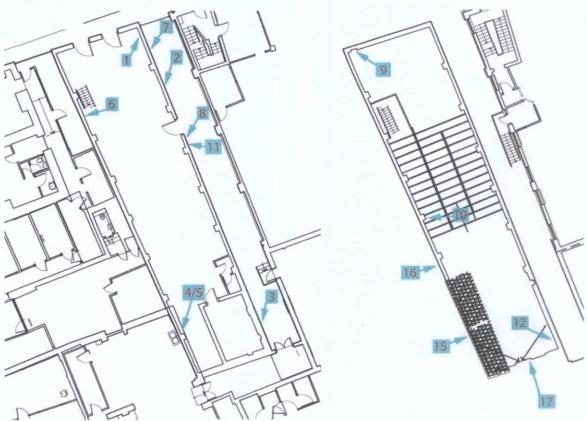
Ground and first floor plan of No.10 Henry Place showing sampling locations.
